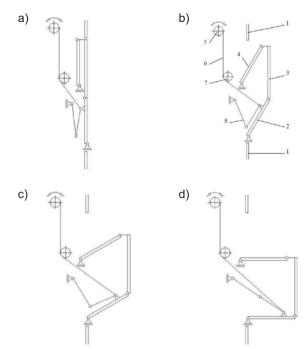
Kinematic diagram of the window-to-balcony module: a – closed position (window); b – tilted position 1 (30°); c – tilted position 2 (60°); d – open position (balcony); 1 – external wall of a building; 2 – balcony decking; 3 – balustrade; 4 – balustrade handrail; 5 – flexible cable drive system; 6 – flexible cable; 7 – passive roller; 8 – articulated rigid rod
